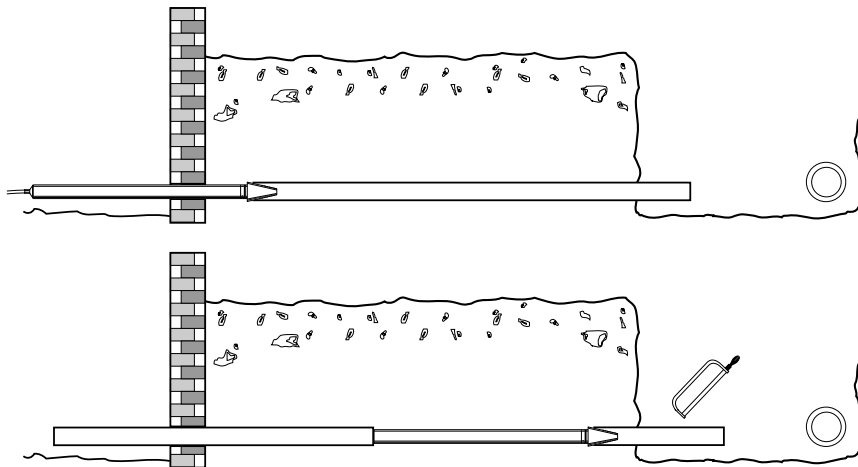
OLD STEEL PIPE OUT, NEW PIPE IN
